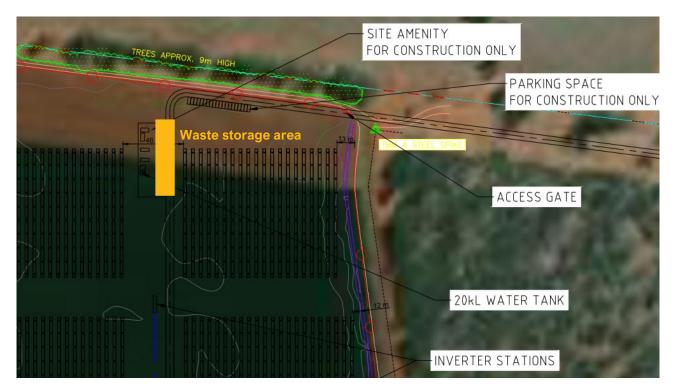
Waste storage area (GGE/NGH, 2024).
